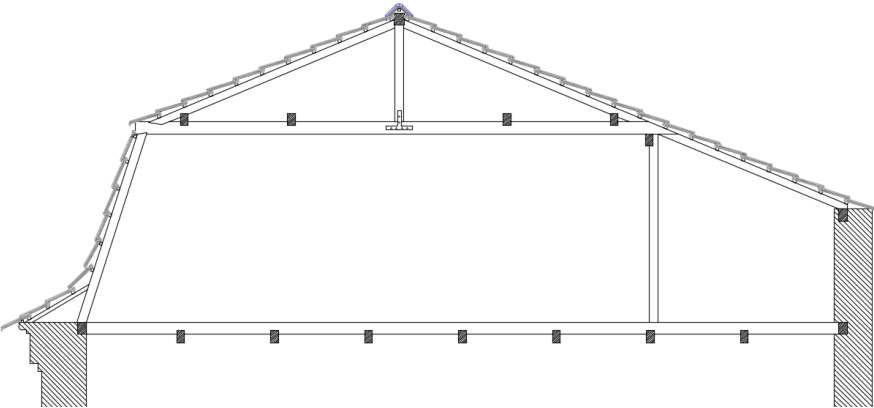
Example of a mansard roof type cut section – Adapted from (Mascarenhas, 2004)
